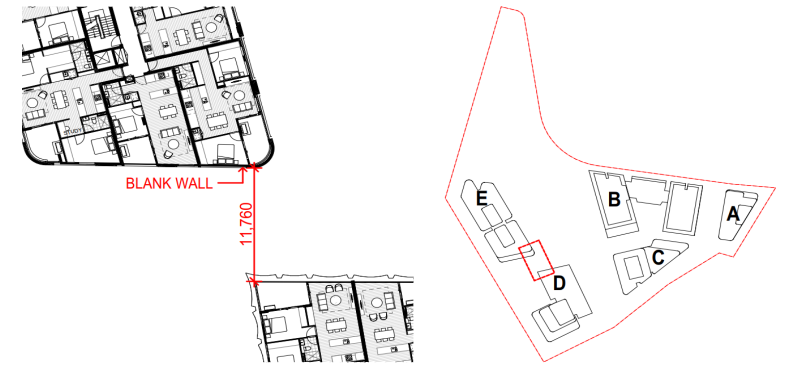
F1.1 Building D-E separation (storeys 1-2) & Key Plan (NTS)
